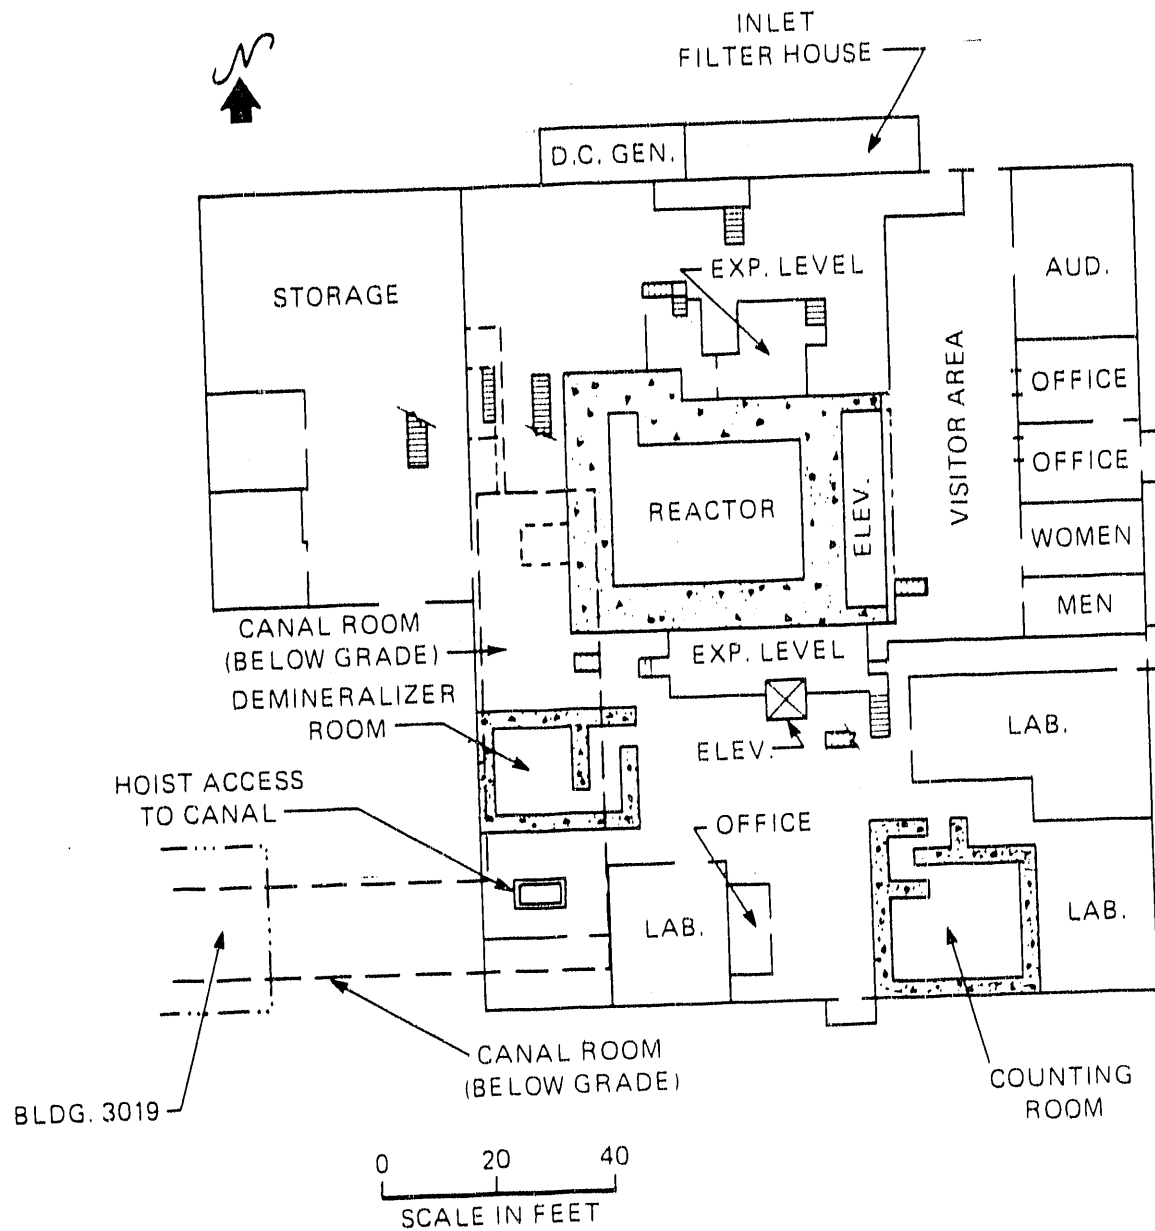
Floor plan (first level) for the Graphite Reactor (Building 3001).
